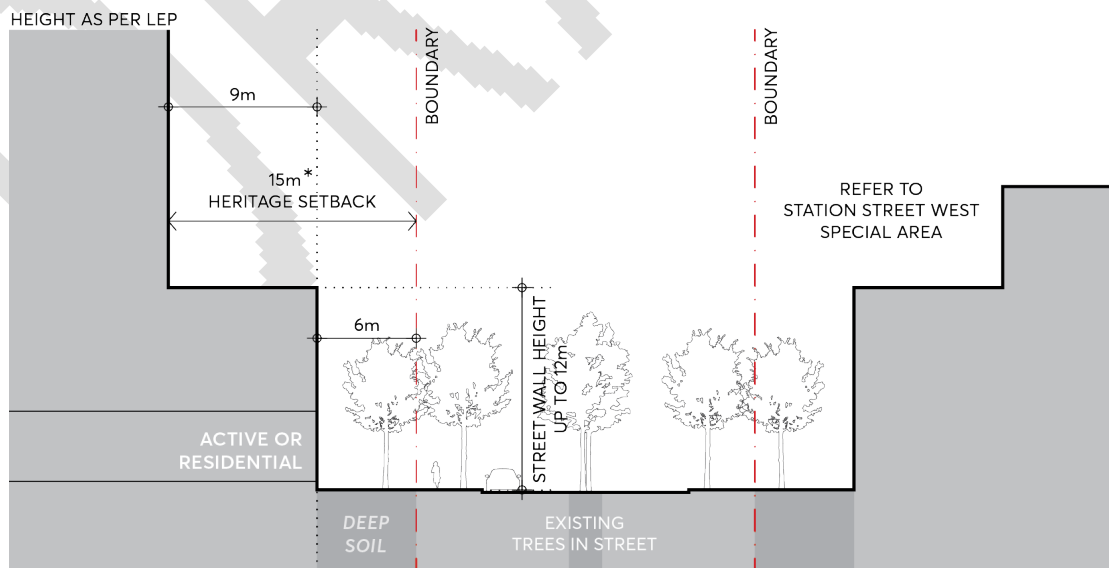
Dixon Street (Section B) Setbacks and Street Wall Height
